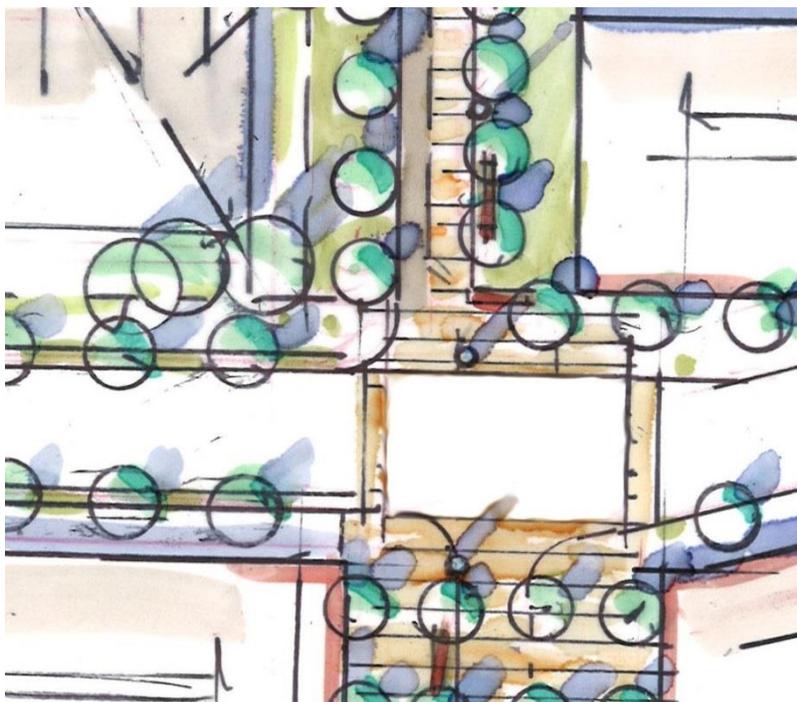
Plan View of Intersection at UWalk North and Duke Avenue
